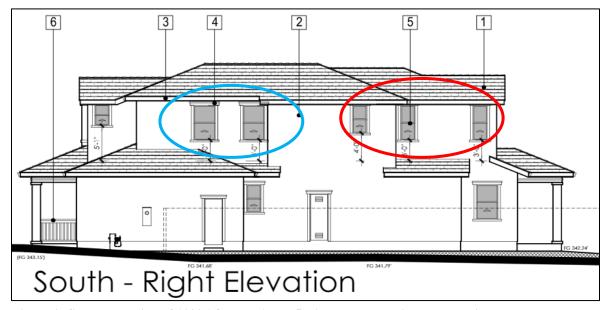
South Elevation of 10206 Orange Ave – 5 windows need privacy protection
